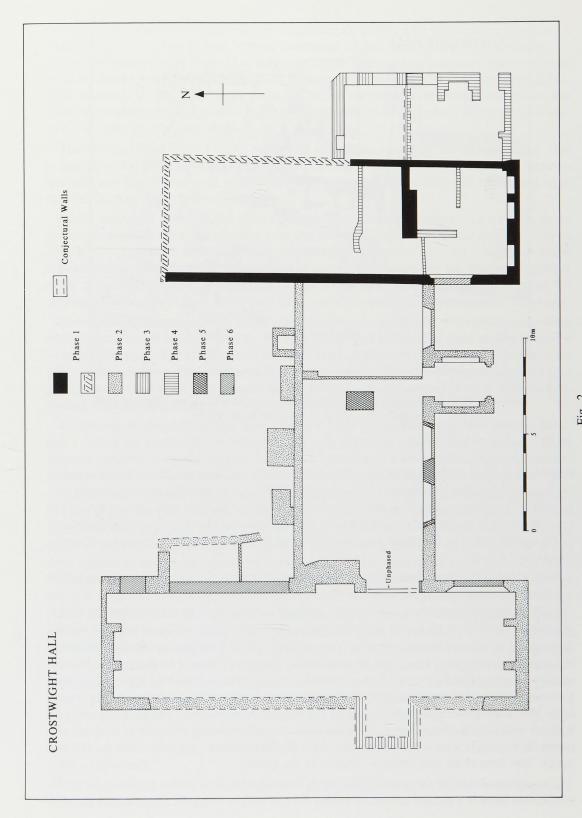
Crostwight Hall; phase plan. Scale 1:200. Drawn by S. White.
